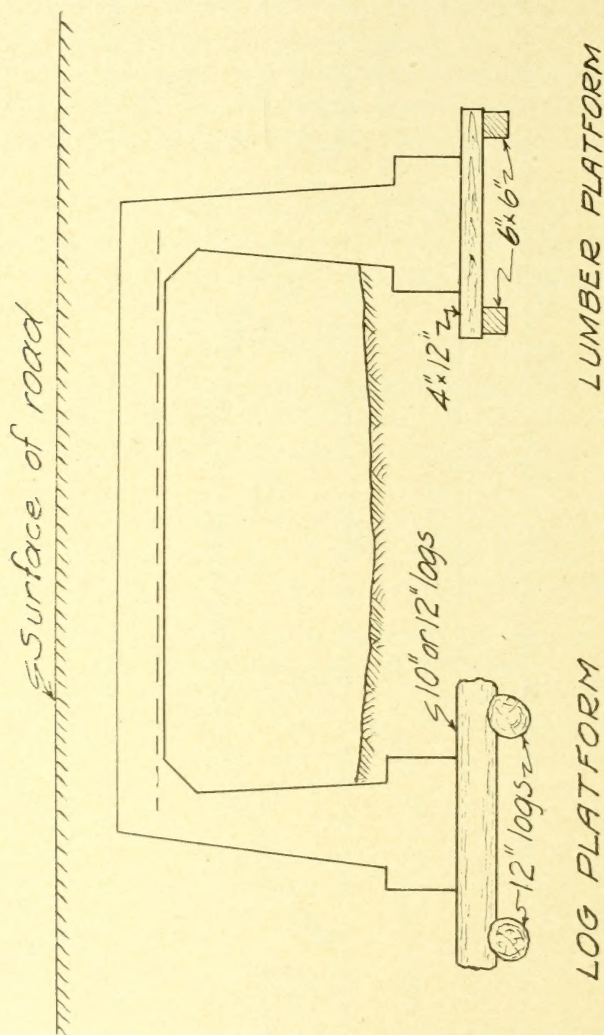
Methods of spreading the weight of a concrete structure over a large foundation area.
